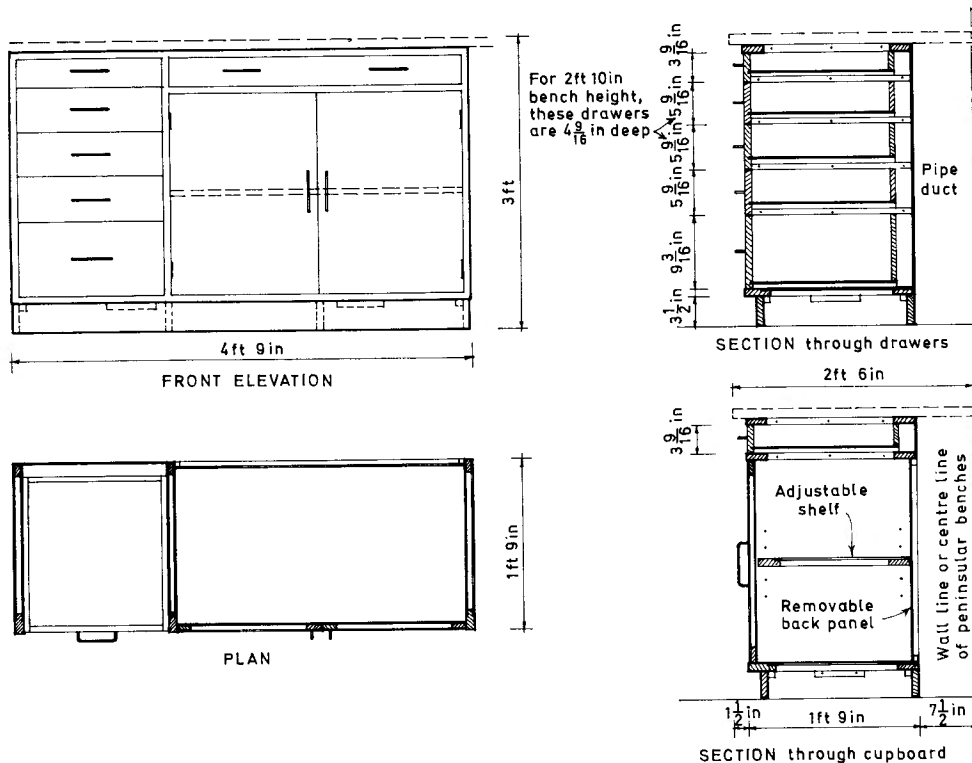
Typical construction details for CSIRO standard bench units; the unit shown is Type D2.
